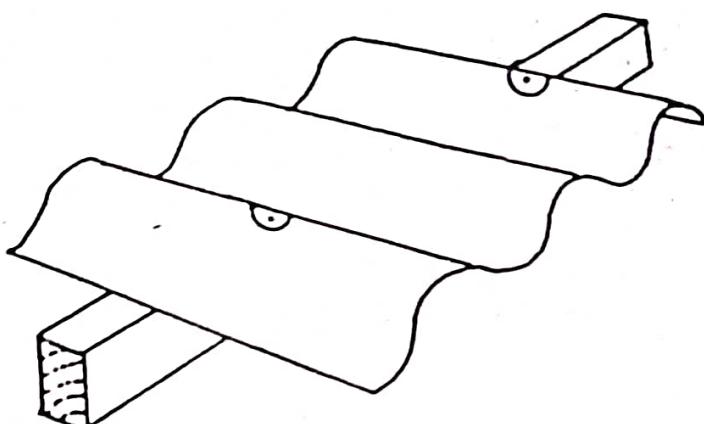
Use of washer in nailing corrugated roof sheeting to purlins
